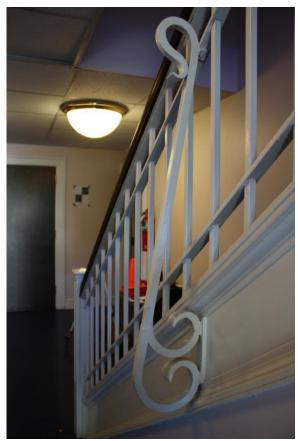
, Historic Courthouse, First Floor, Room 132 (Stairway 2), detail view of one of the scrolled metal brackets.
